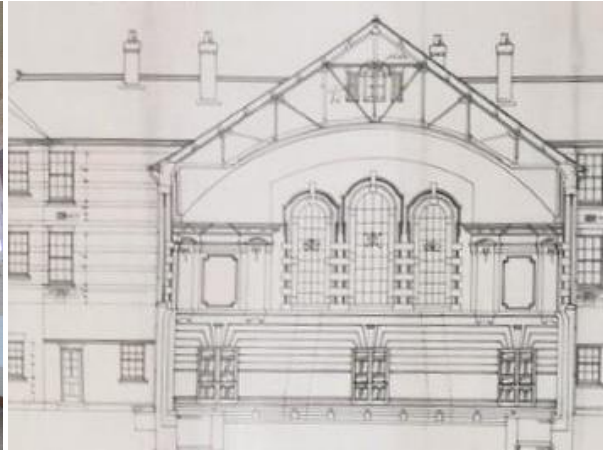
, Section drawing, roof & ceiling construction (Skinner, 2019)
